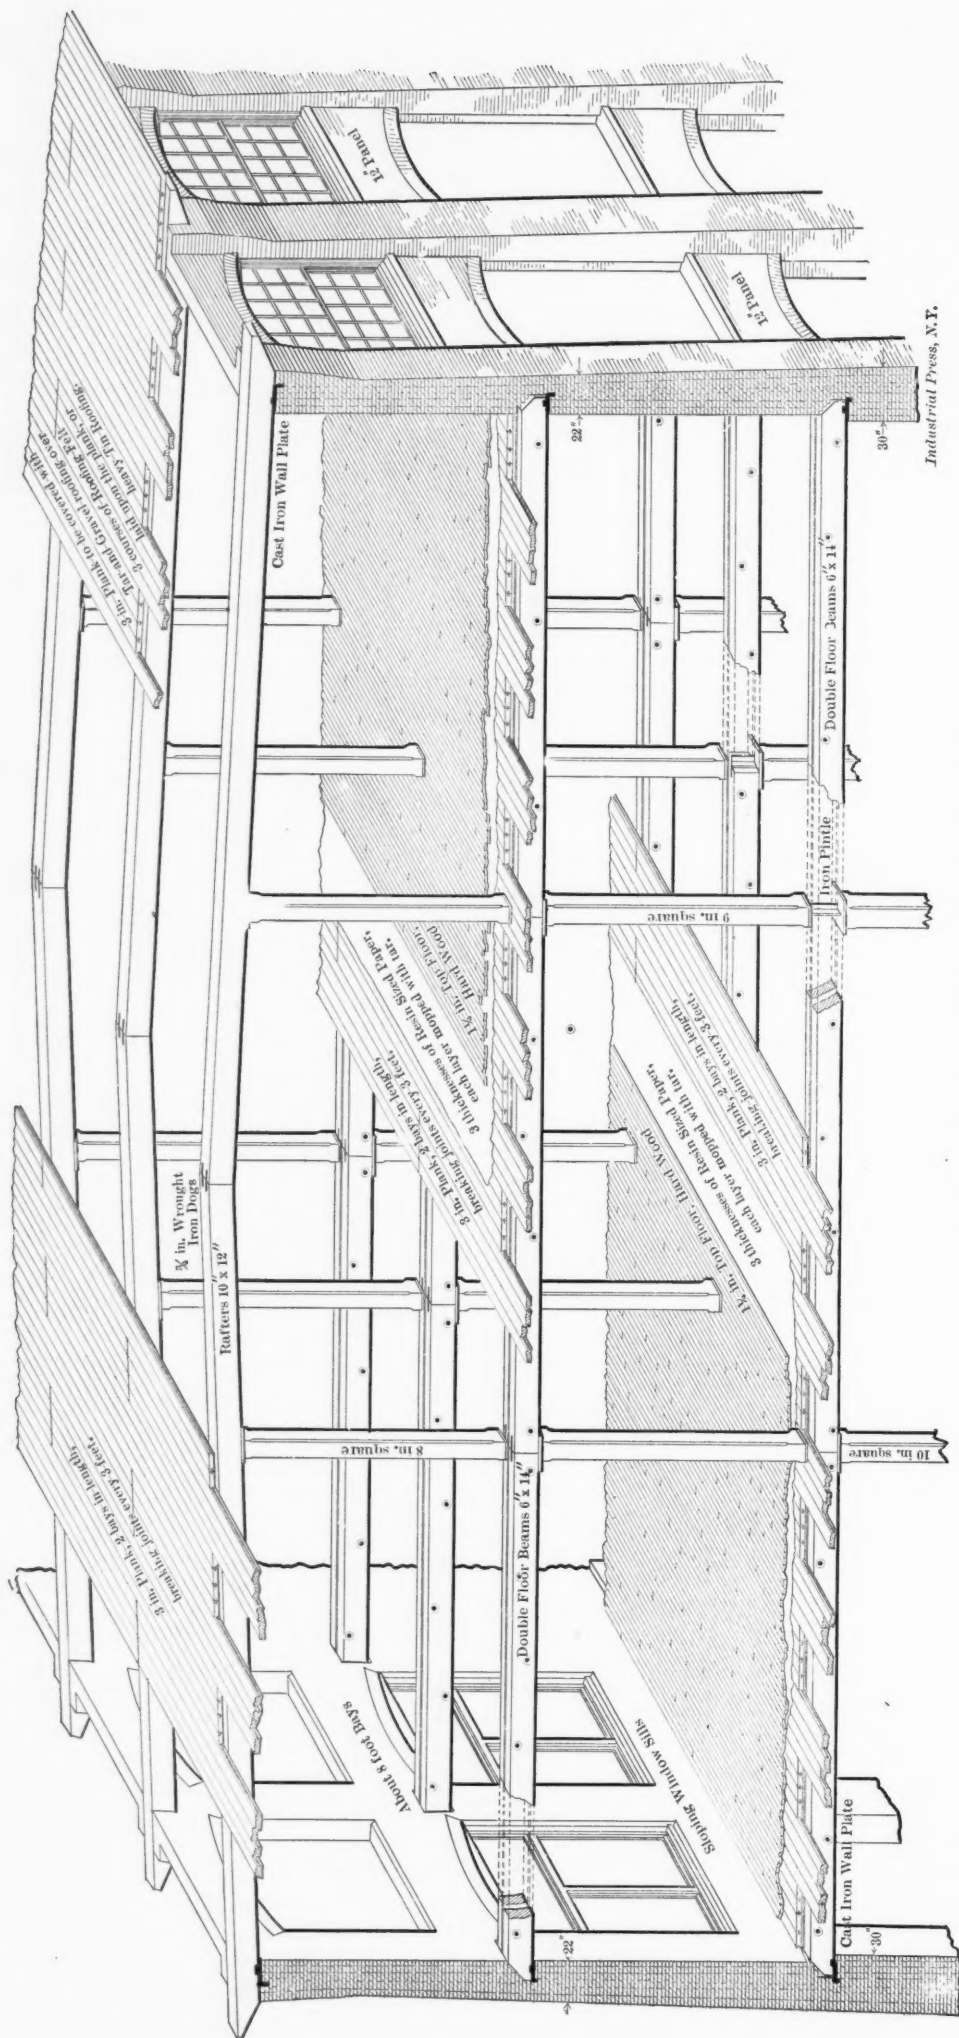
Slow-burning or Mill Type of Building for Manufacturing Purposes.
